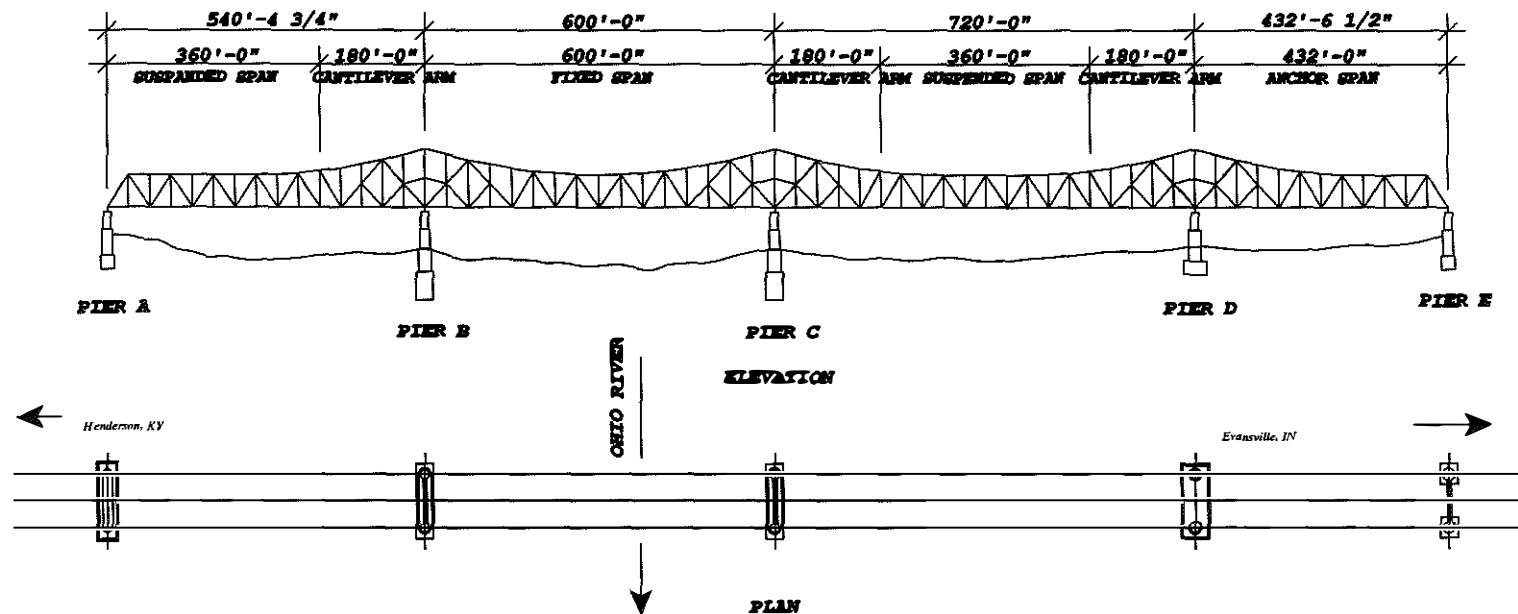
Plan and Elevation Views of the US41 Southbound Main Bridge over the Ohio River
